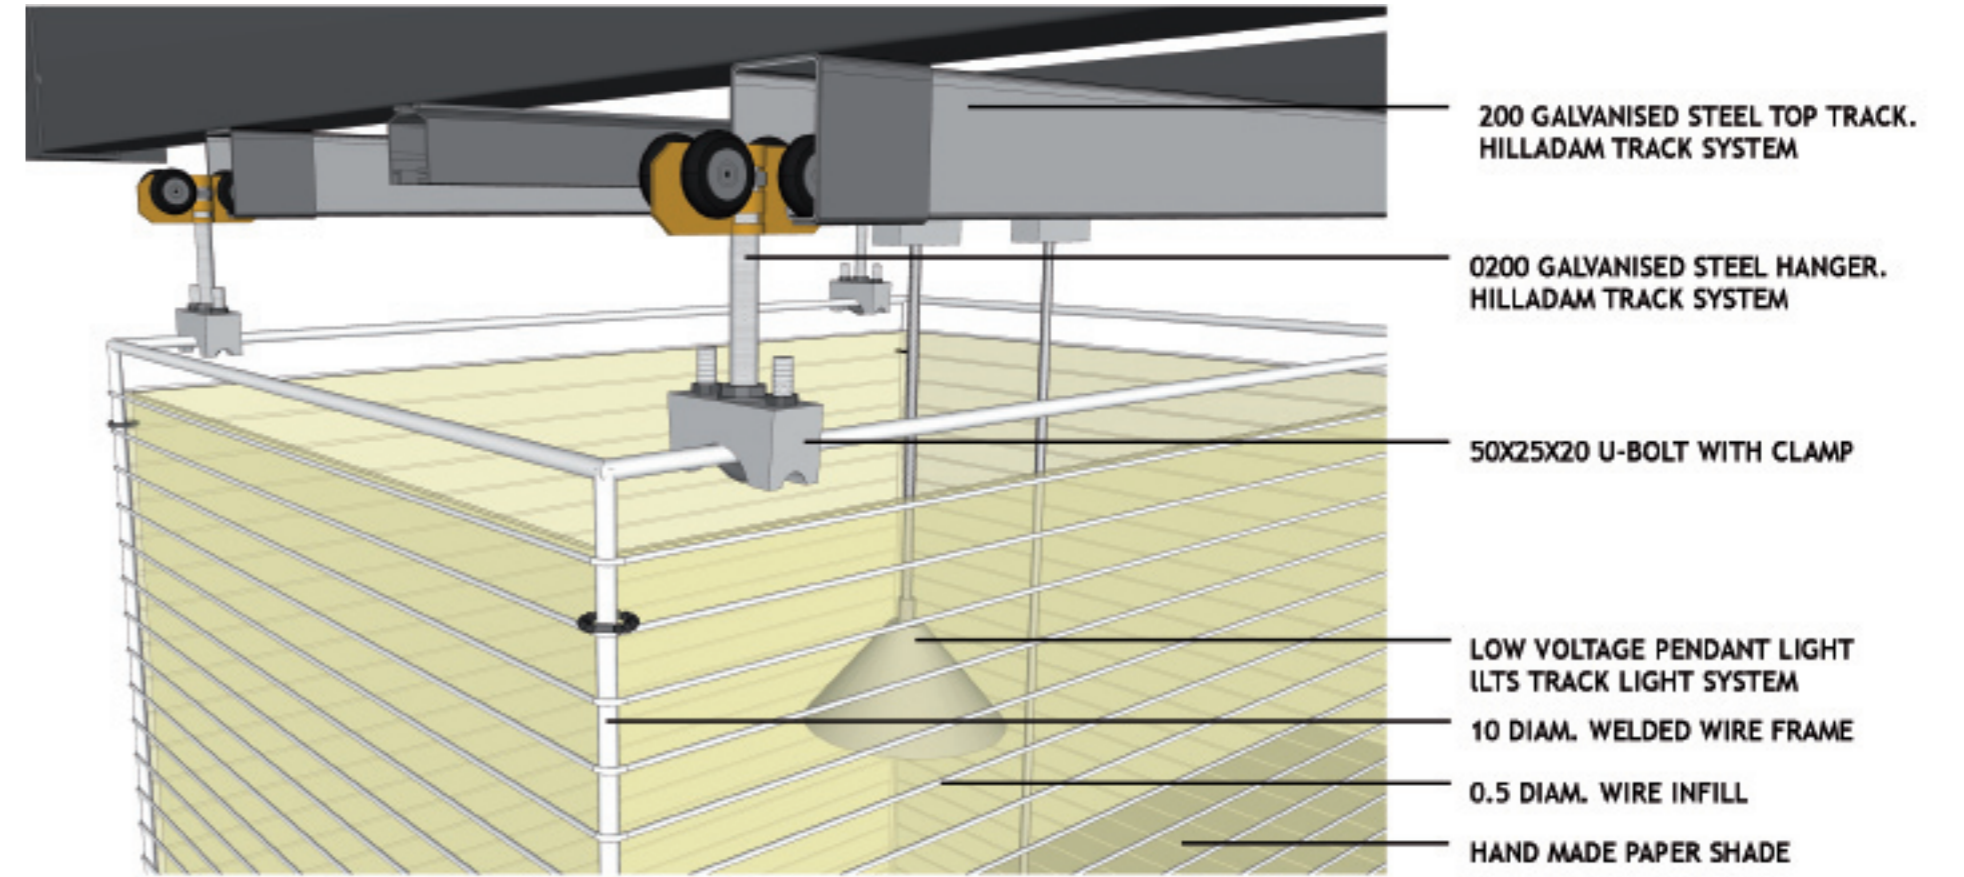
Travelling column on Hillaldam 400 sliding door track system
